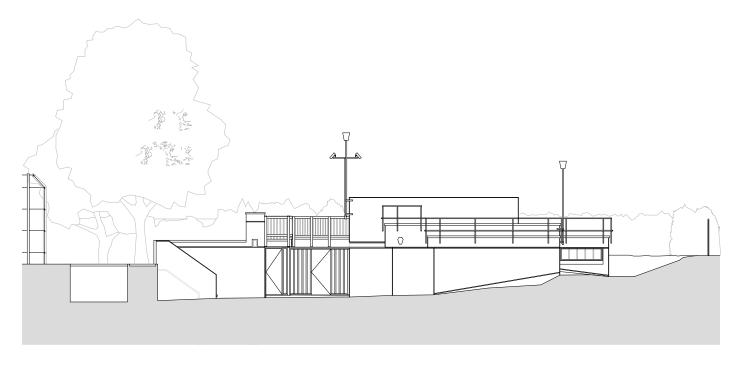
84-86 Abbey Road - Existing north elevation.
